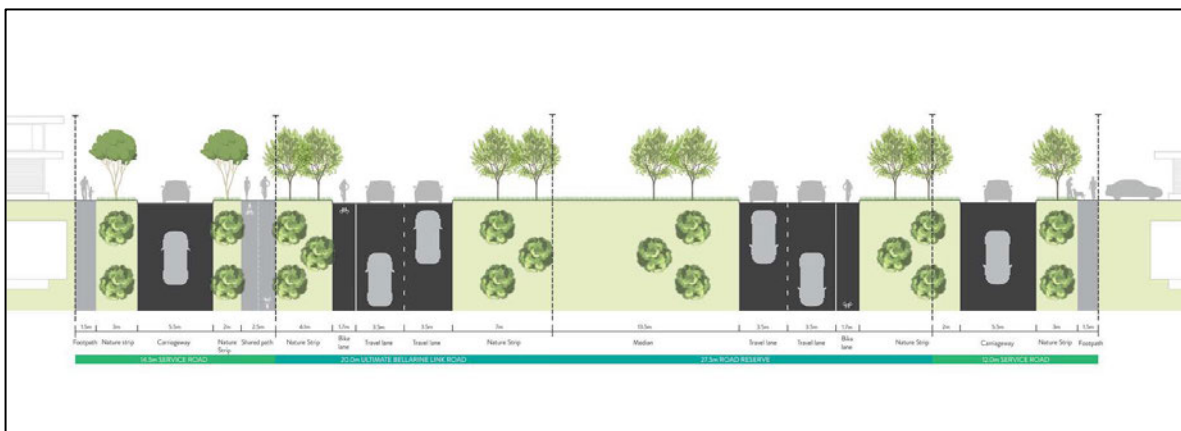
Proposed Bellarine Link Road interface, providing 74m of low threat and non-vegetated setback for development on the southern boundary of the precinct.
